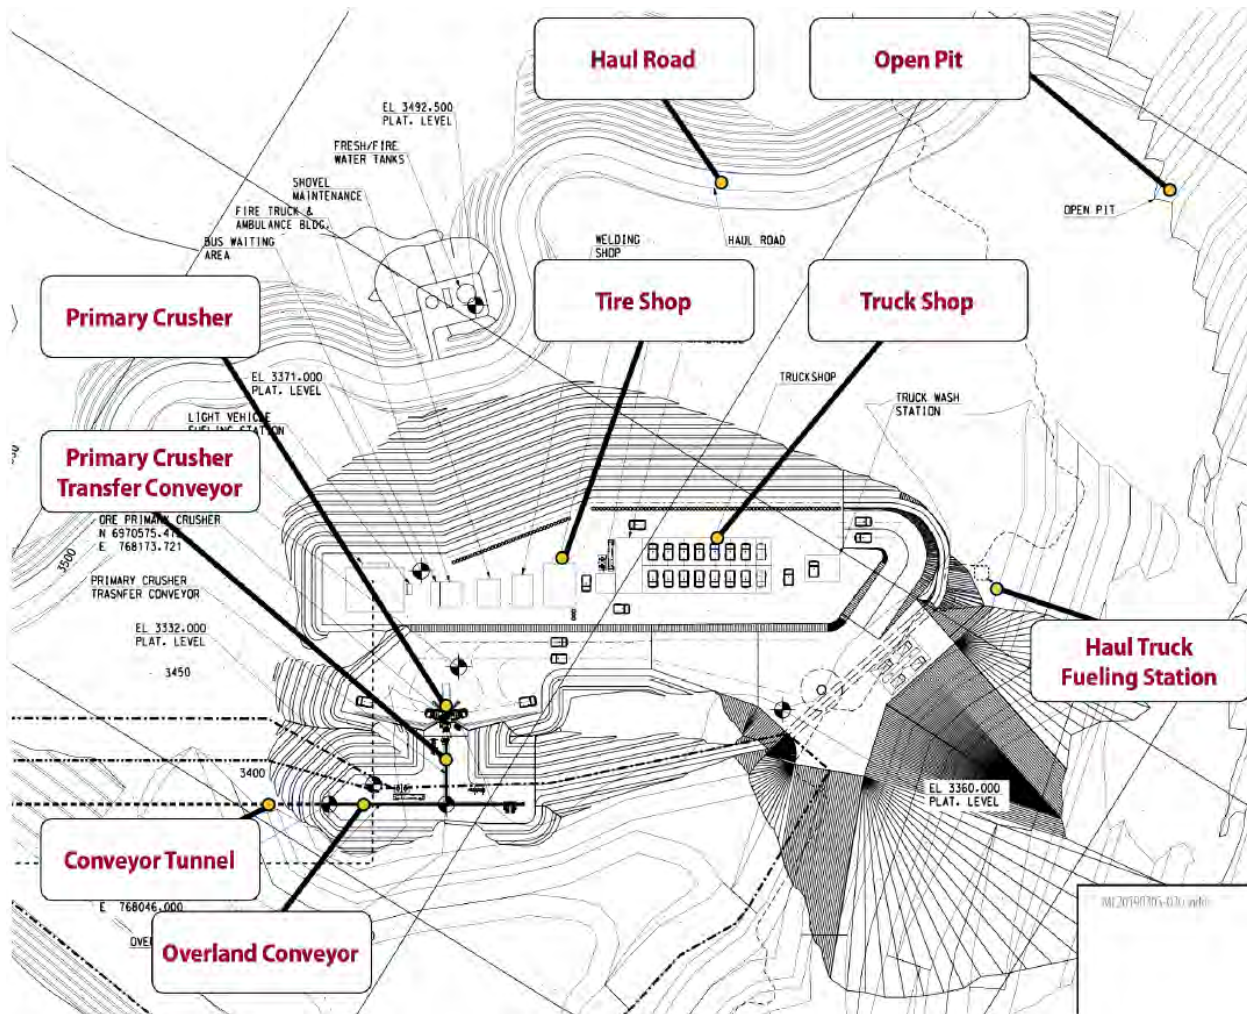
General Arrangement – Primary Crushing and Mine Services
